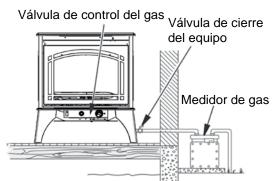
Checking Gas Joints (Natural Gas Only)
